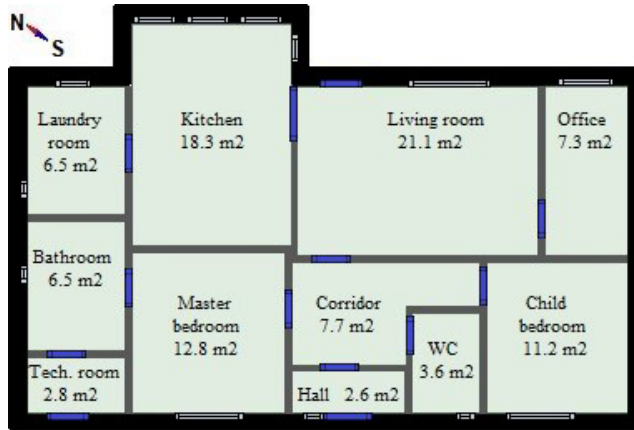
Floor plan of the single family house with area sizes; doors: blue; windows: light grey
